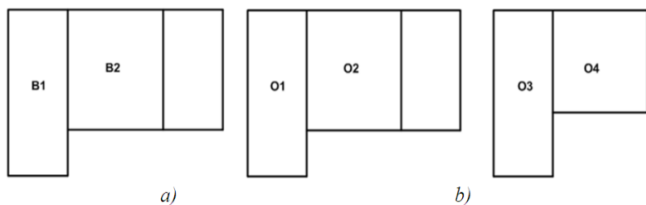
Joinery work of bachelor (a) and one-room apartment (b)
